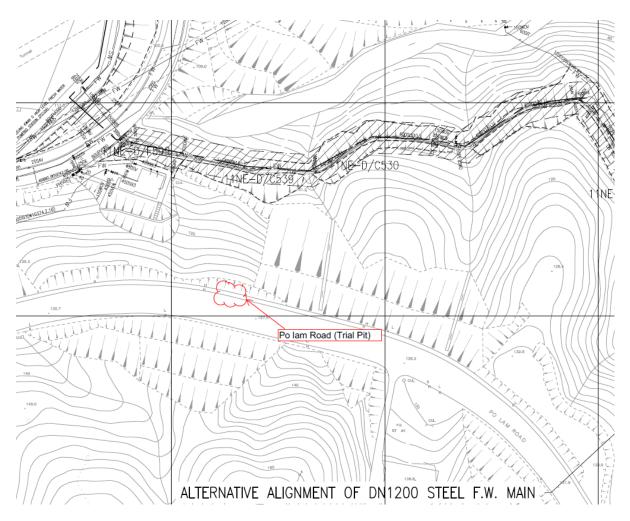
Location Plan for Other Area – Po Lam Road (PLR)
